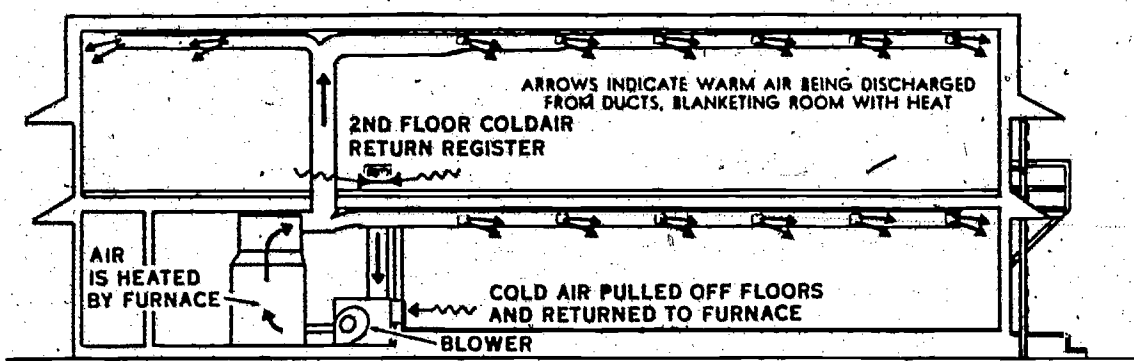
A typical forced warm-air duct layout for a two-story barracks.
